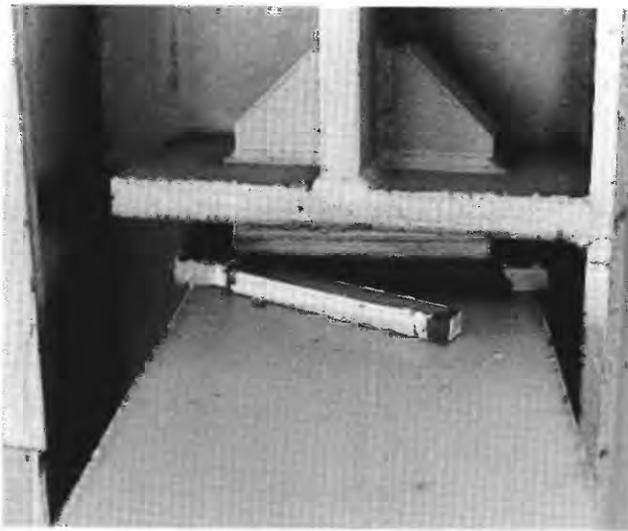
Keeper Plate Damage on the Distribution Structure (photograph by Li Hong Sheng).
